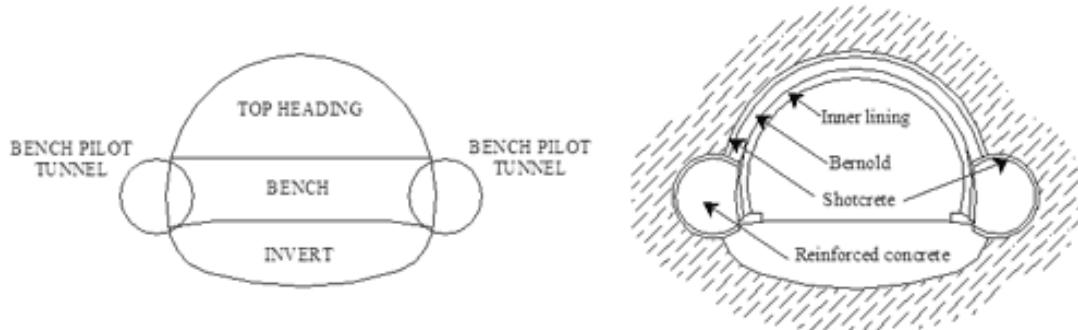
Bench Pilot Tunnels (Astaldi, 2004)
